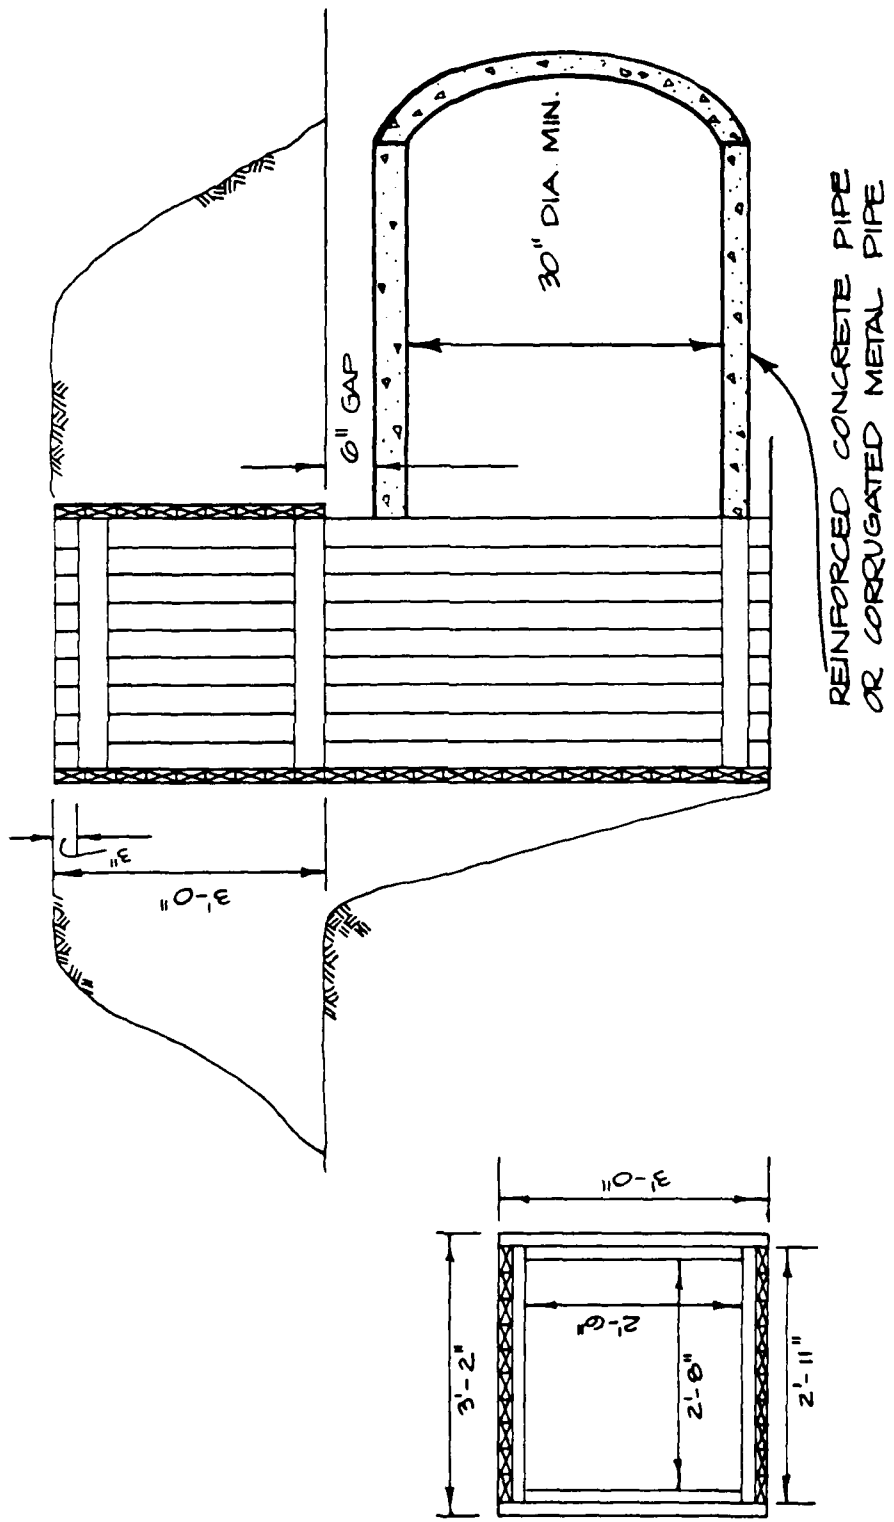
Typical Entryway to Buried Shelter With Culvert Shown.
